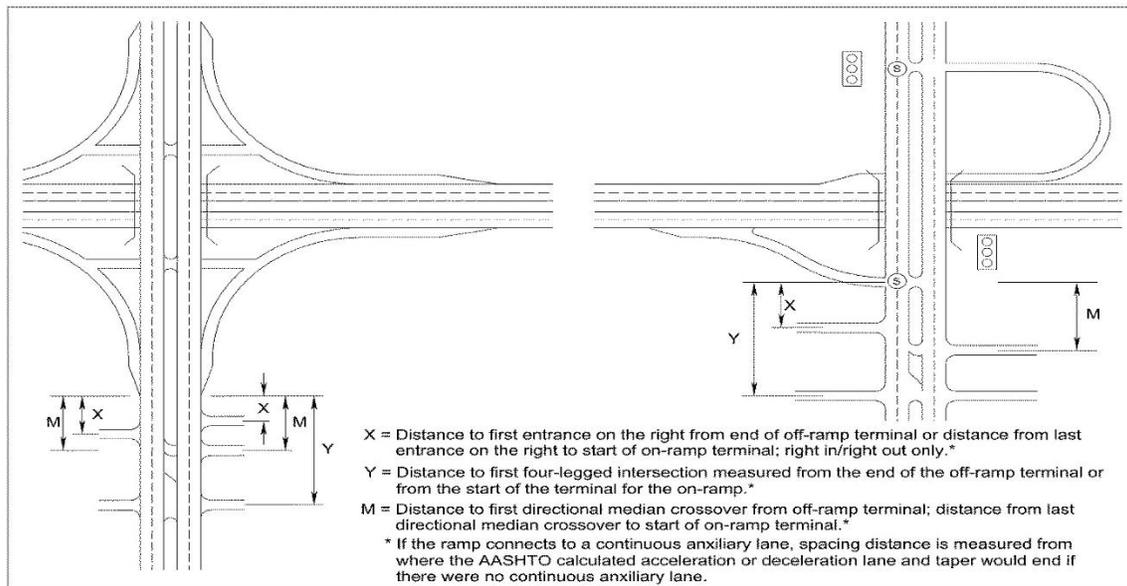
Minimum Spacing Standards for Commercial Entrances, Intersections, and Median Crossovers<sup>10</sup>
